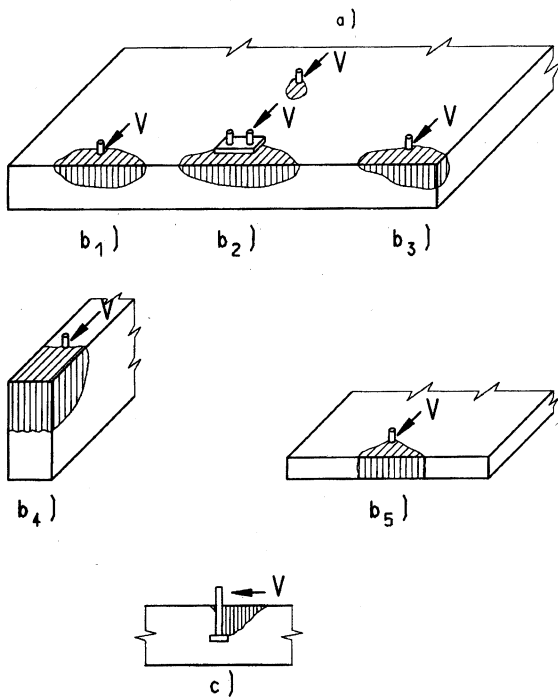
Failure modes for fastenings under shear loading: (a) steel failure preceded by concrete spall; (b) concrete breakout; (c) concrete pryout failure for fastenings far from edge
